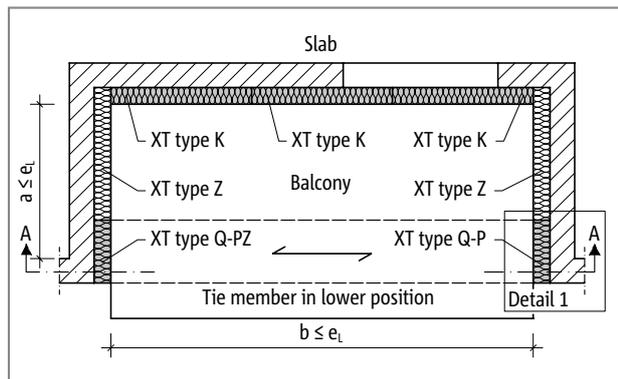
Schöck Isokorb® XT type Q-PZ, Q-P: Plan view recessed balcony
